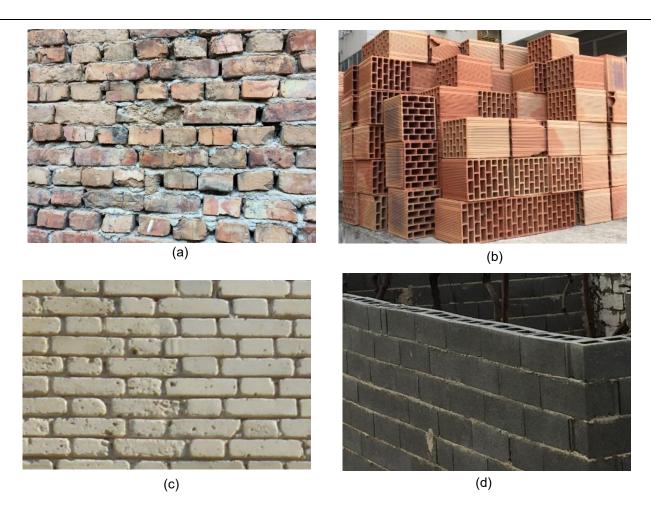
Types of masonry units used in Albania: (a) solid clay bricks, (b) clay blocks, (c) silicate bricks, and (d) hollow concrete blocks (photos: SUZI-SAEE).
